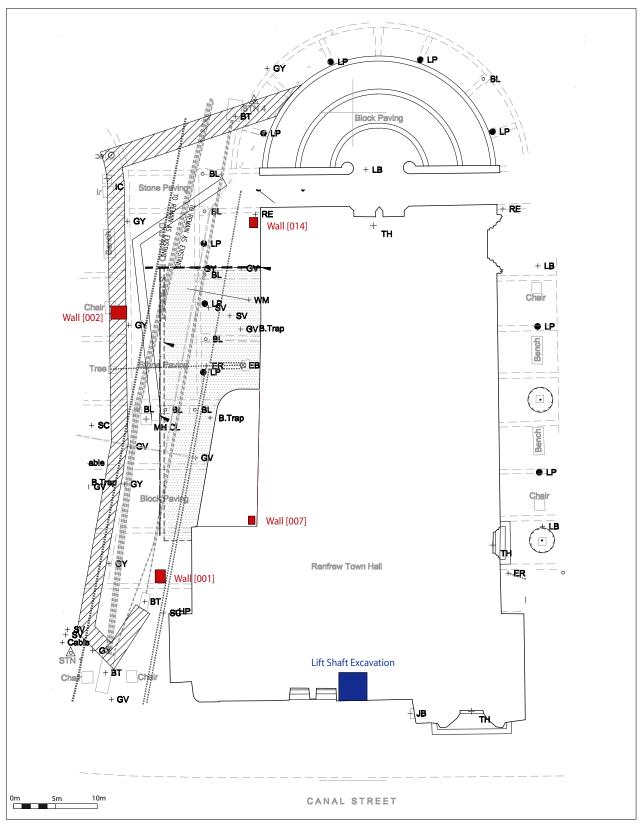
Plan of Development Showing the Location of Groundworks Monitored
